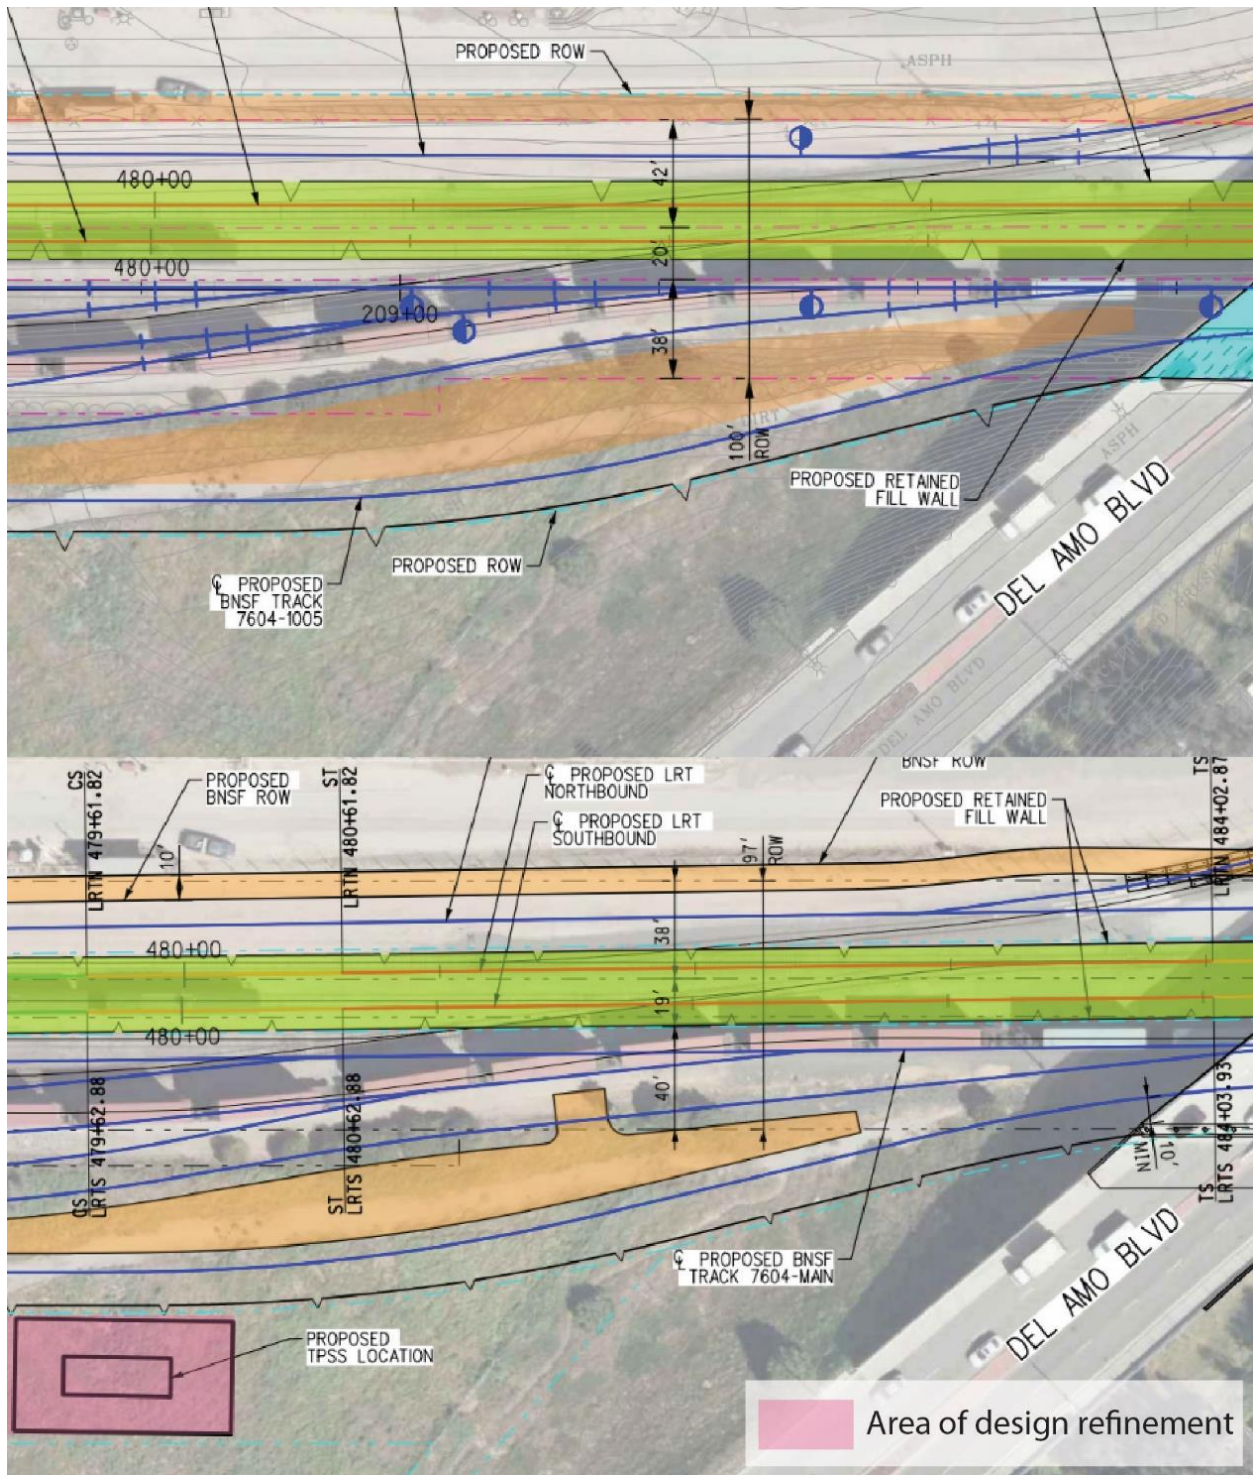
illustrates how the proposed TPSS design refinement sites correspond to the project component locations previously presented in Appendix 2-A, Select Advanced Conceptual Engineering Drawings, of the Draft EIR. These sites, as previously presented, included areas proposed for either new track and buildings or the expansion of existing structures. Although the installation and operation of a TPSS would introduce a new use within these sites, the uses would be of similar scale and intensity to the project components previously proposed in the Draft EIR.
